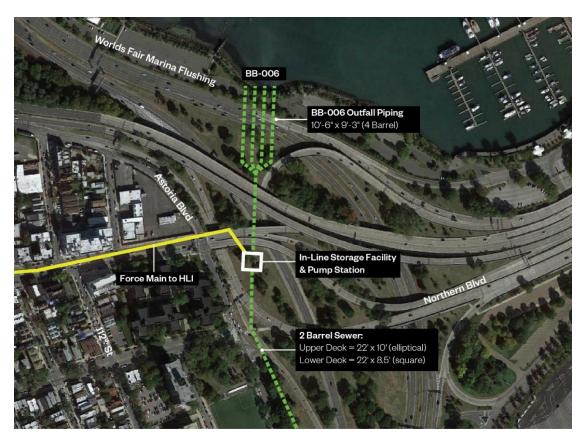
Layout of Alternative 9-3 - Outfall Storage for BB-006
